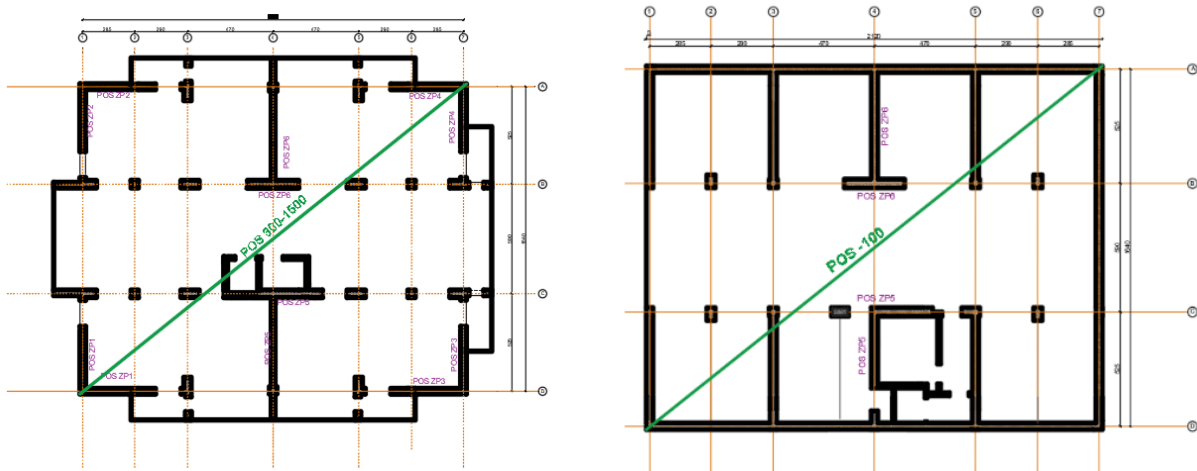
Floor plan of floors above (left) and below (right) ground level.
